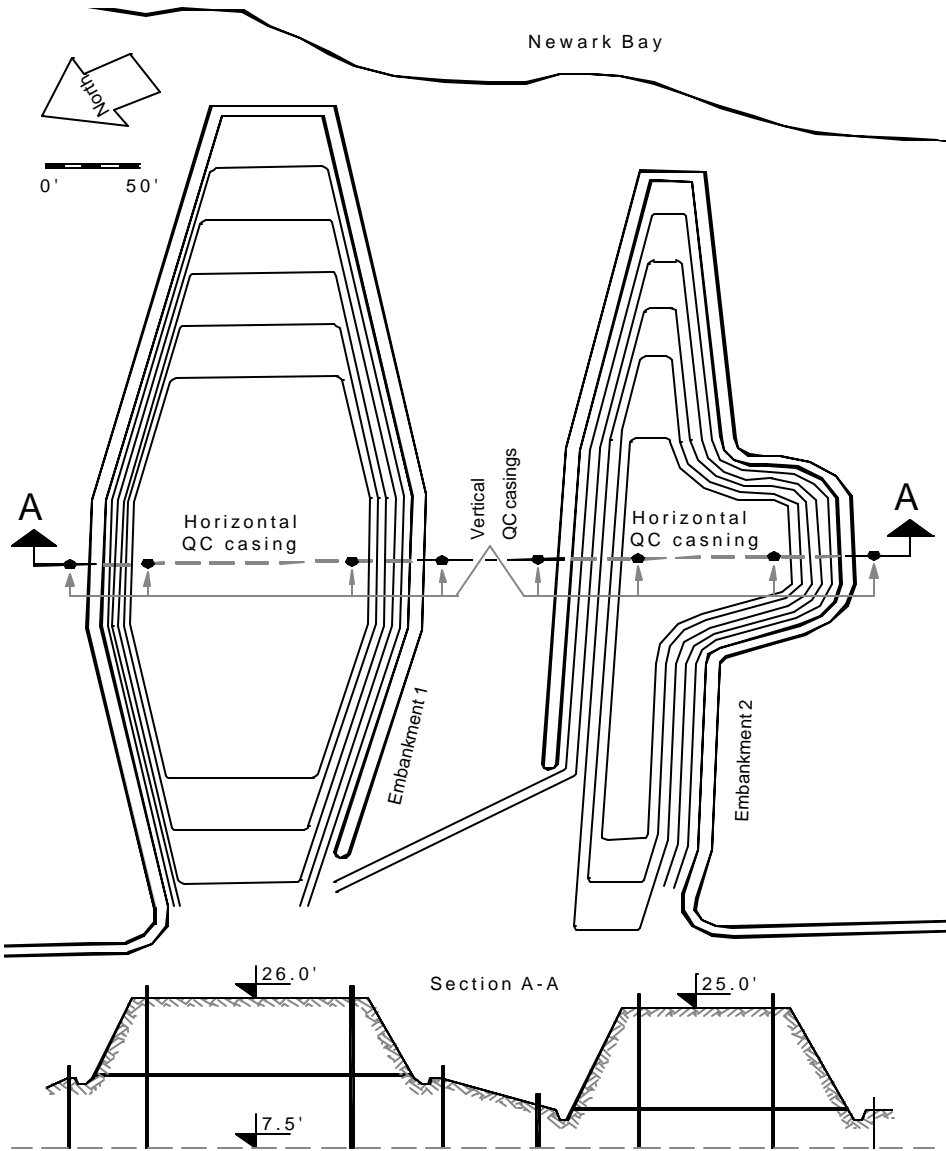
Aerial View of Portland Cement Stabilized Dredge Material Embankments
